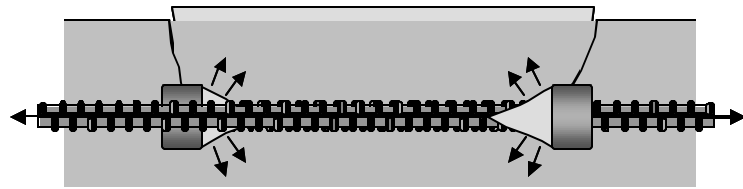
Crack development in a typical unconfined lap splice test (specimen LS-08-04.04-12-10(N)-1) (continued)
